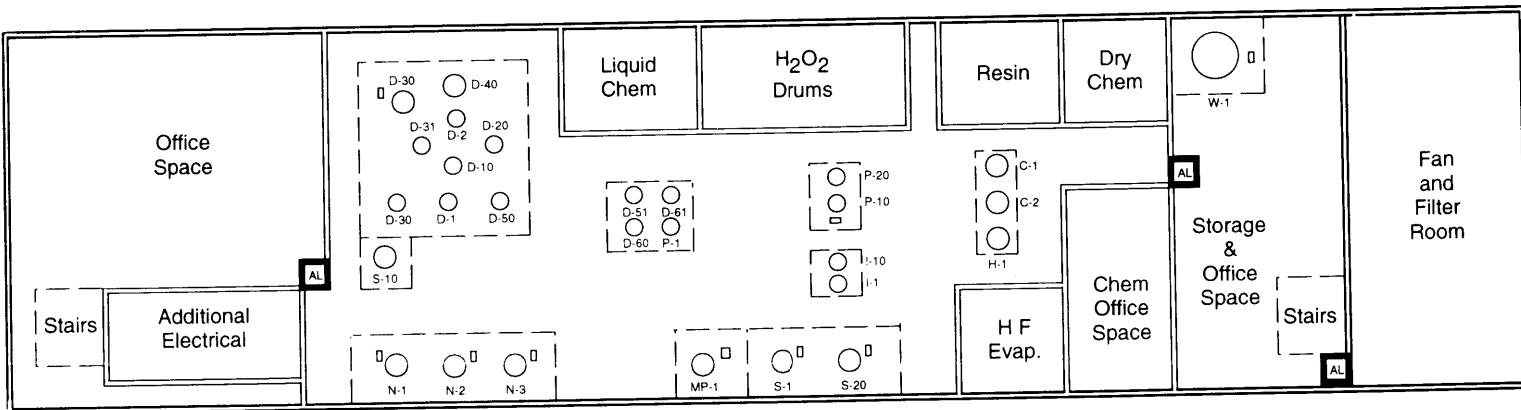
Plutonium Recovery Facility Second Level Floor Plan
